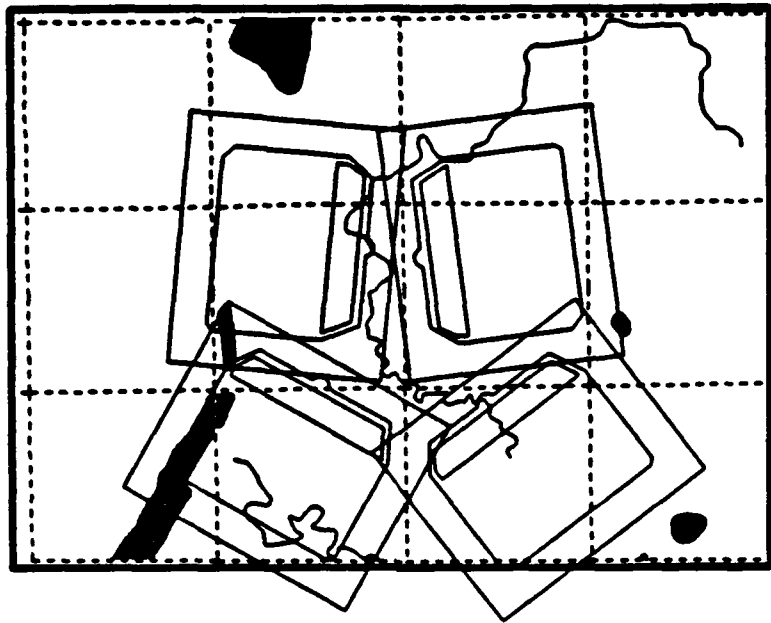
TX-SOUTH PRELIMINARY SITE LAYOUT
